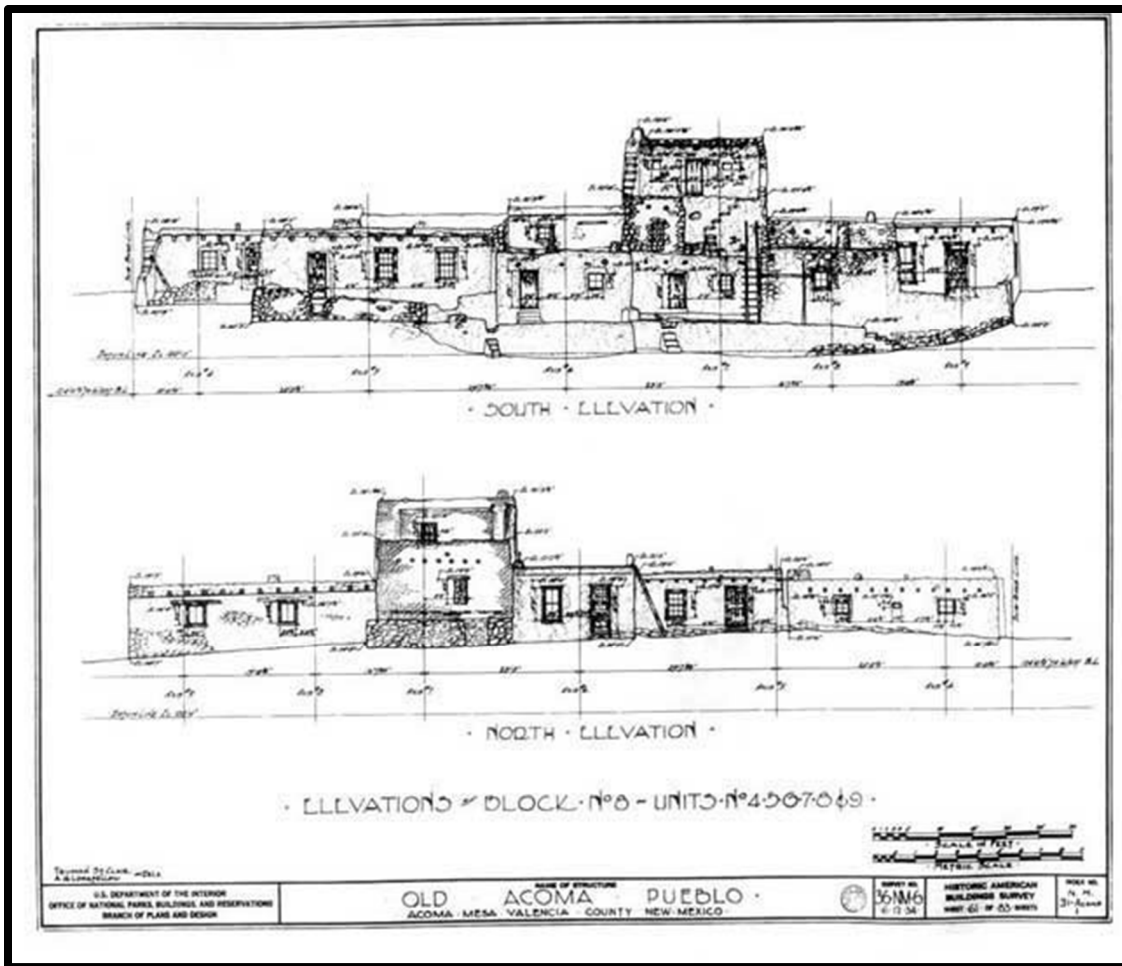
A typical cross-section of homes at Sky City at the Pueblo of Acoma. The cross-sections show the intricate planning of floorplans and use of space. Peter Nabokov; Architecture of Acoma Pueblo: The 1934 Historic American Buildings Survey Project, (Santa Fe: Ancient City Press, 1986).
